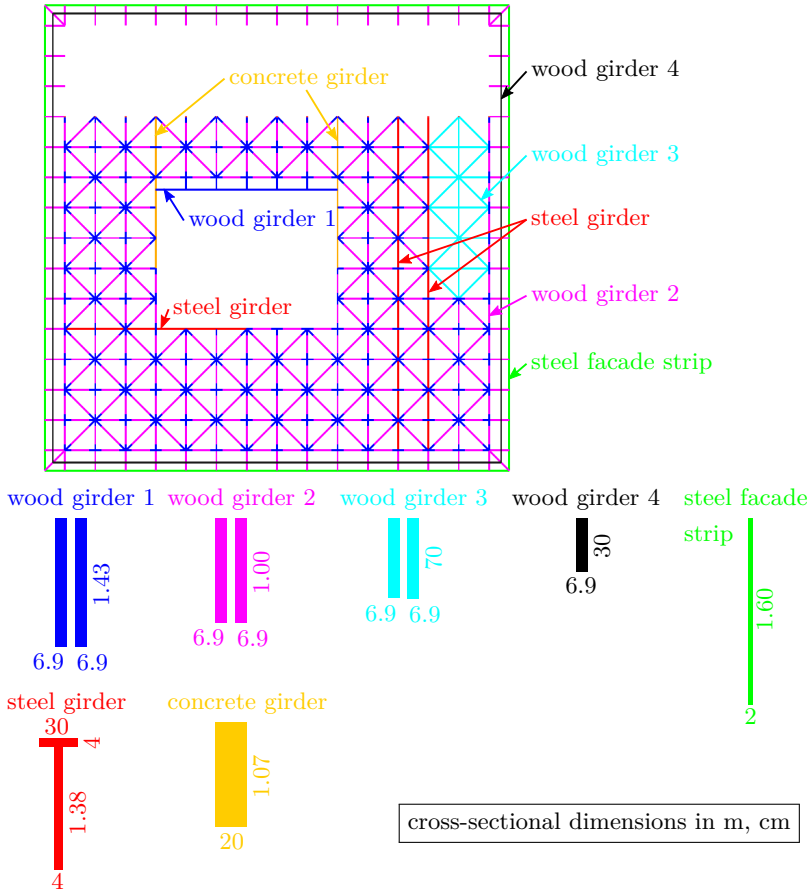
Overview of the utilized girder cross-sections in a roof construction.
